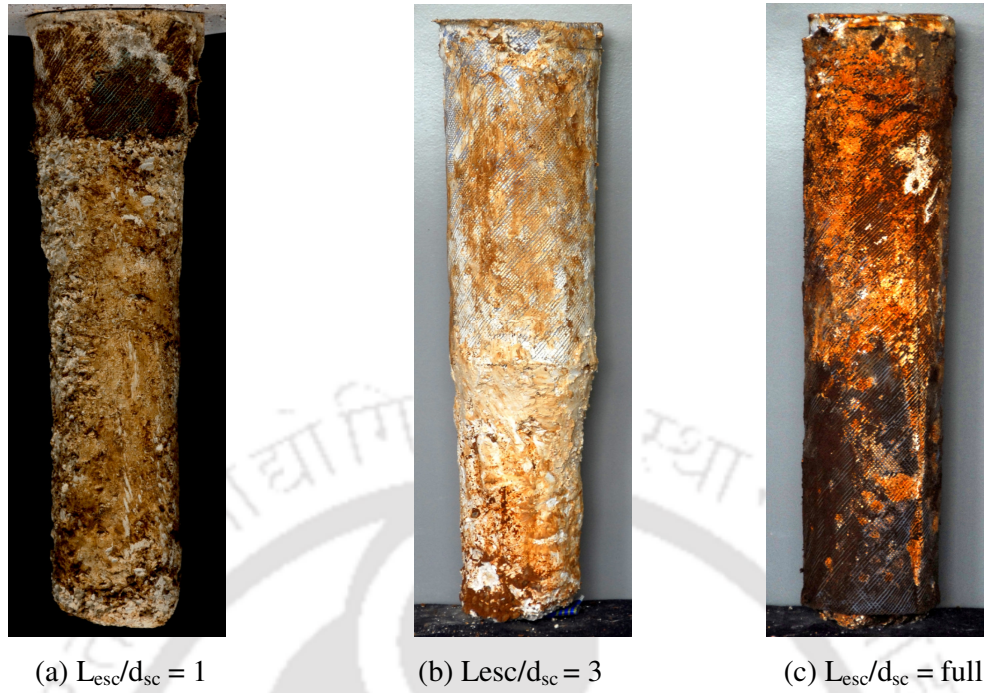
Post-test deformed shape of the encased central stone column in composite foundation beds ($h/D = 0.53$) – Test series 23
